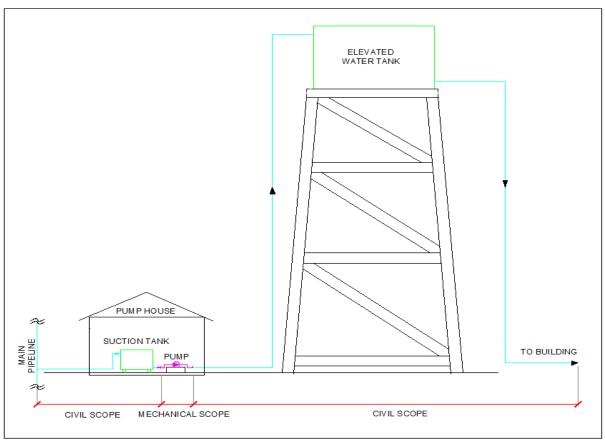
PUMPING TO ELEVATED WATER TANK
